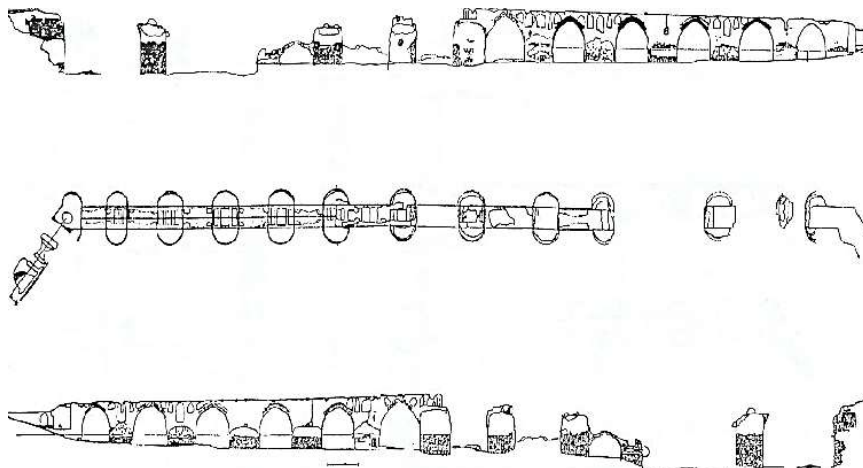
Kashkân Bridge. Plan southern and northern elevation, Anisi, 2007
